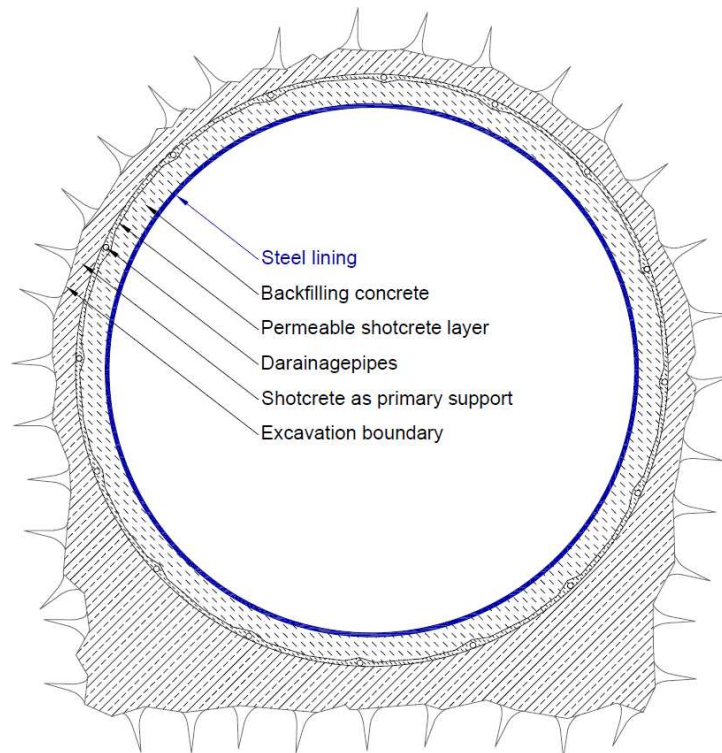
Cross-section of the steel lining for the hydrogen storage at ZaB
